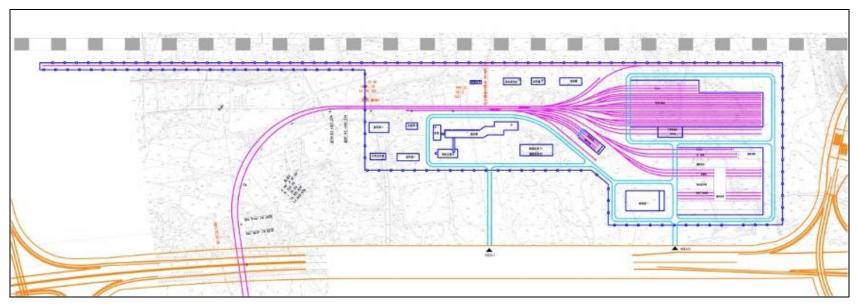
Layout Plan of Hanghai east Road Parking Lot
